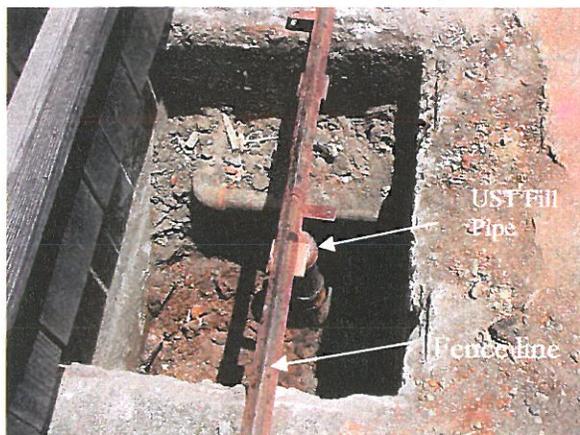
Building 161 UST fill pipe located in vault. Photo taken 5/28/2004.
